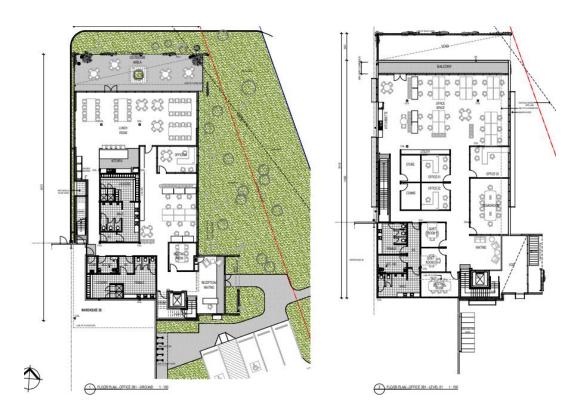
Oakdale West Estate: Building 3B2, Office Plan
